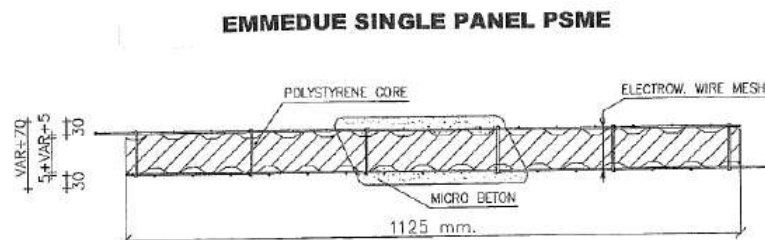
Emedue Single Panel PSM80 Details (Ref. 1, p.7)
